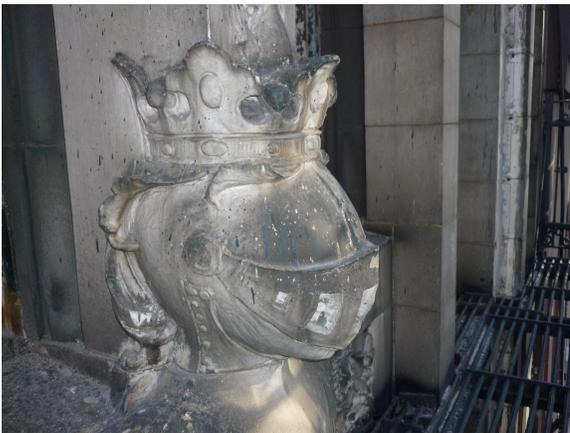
Terra cotta detail, north façade between 3rd and 4th floors.
